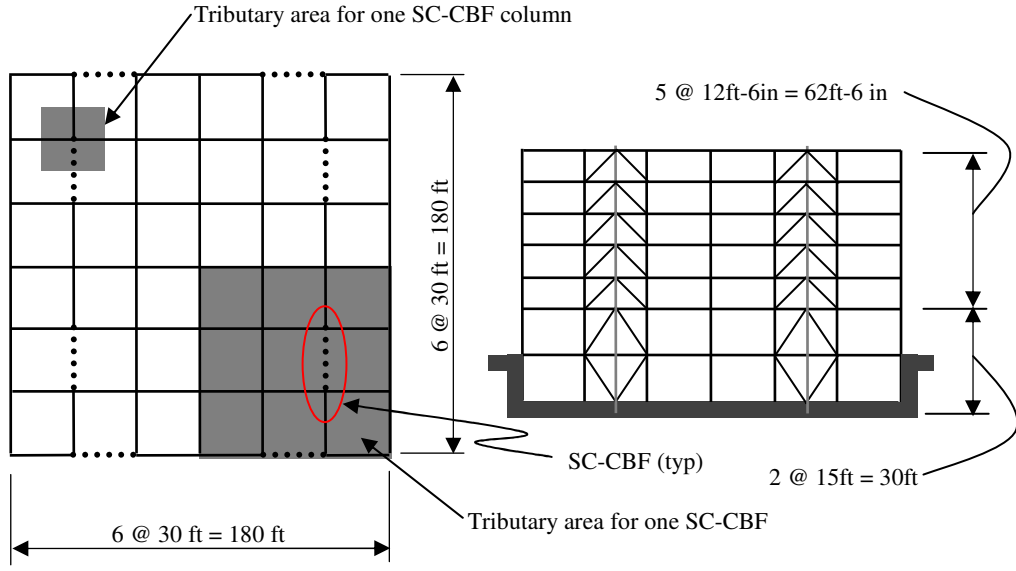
Prototype building used for the frame configuration study: (a) floor plan; (b) elevation
